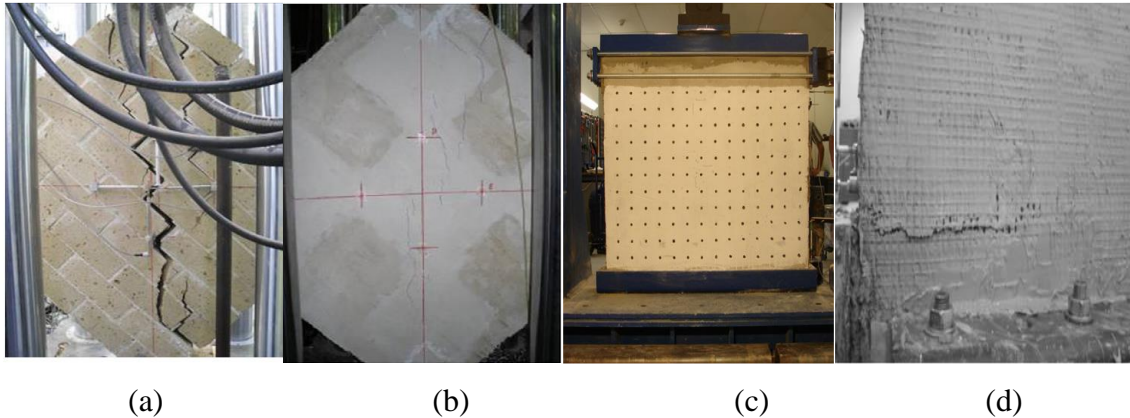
(a) Crack pattern in the masonry wall under diagonal loading without TRM and (b) with TRM, (c) test set-up for in-plane loading, and (d) failures on the retrofitted infill wall under in-plane loading (Papanicolaou et al. 2006, 2007, 2011).
